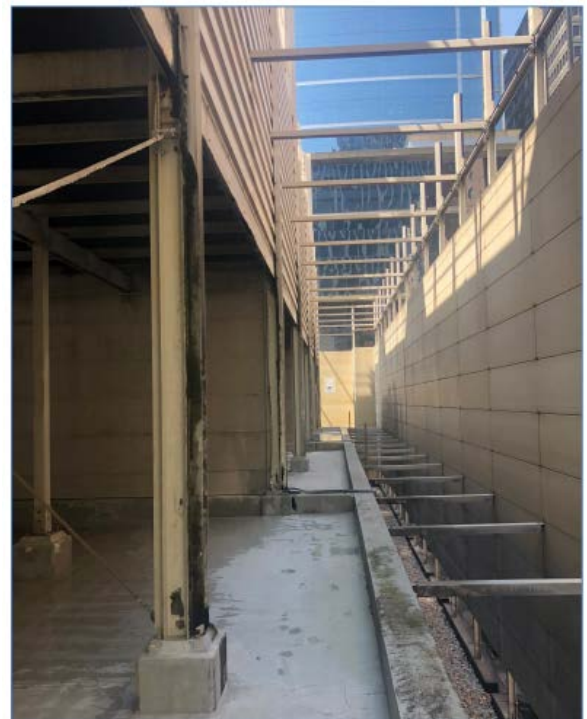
Internal view of air inlet and proximity to architectural screen wall.
